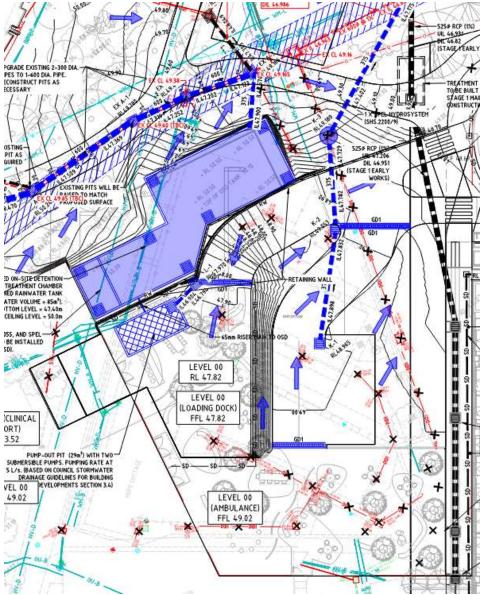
J: Stormwater drainage strategy for Kitchen Loading Dock
